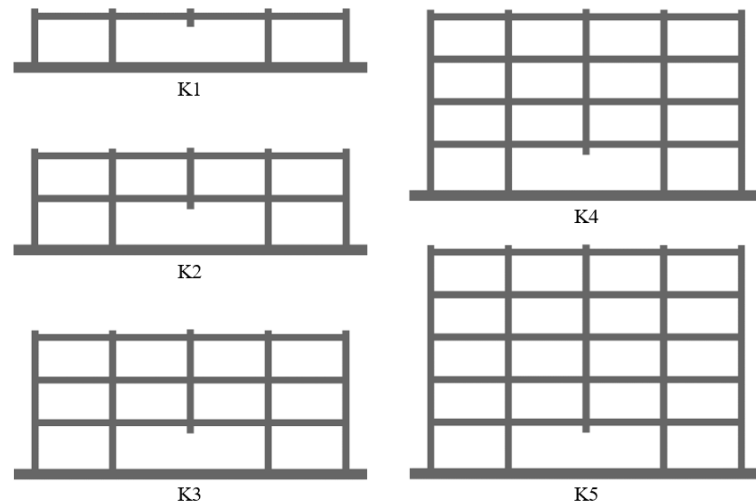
Multi-storey reinforced concrete frames under progressive collapse scenarios.
